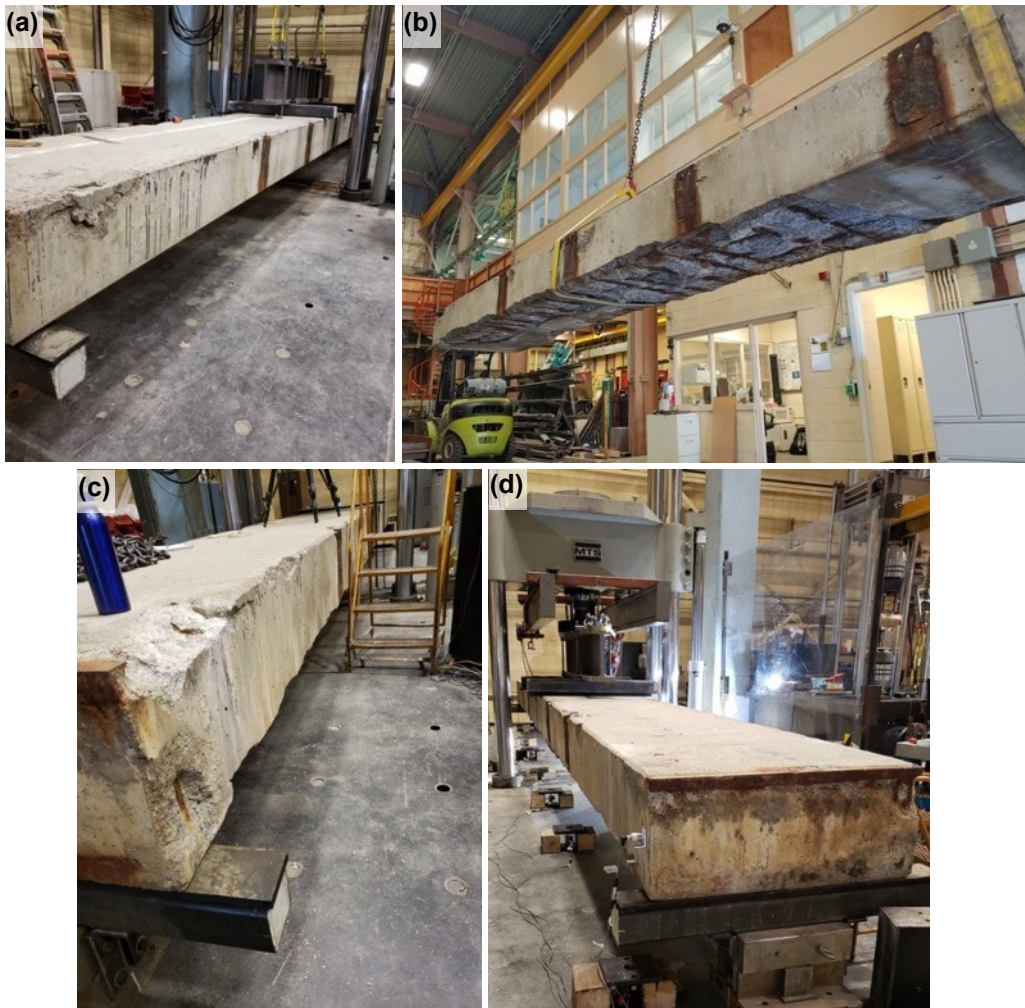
8: Girder conditions (a)Girder LD with no visible damage (b) Girder HD with severe concrete loss and steel corrosion (c)Girder MD with moderate deterioration (d) Girder ID with moderate deterioration and induced corrosion .
